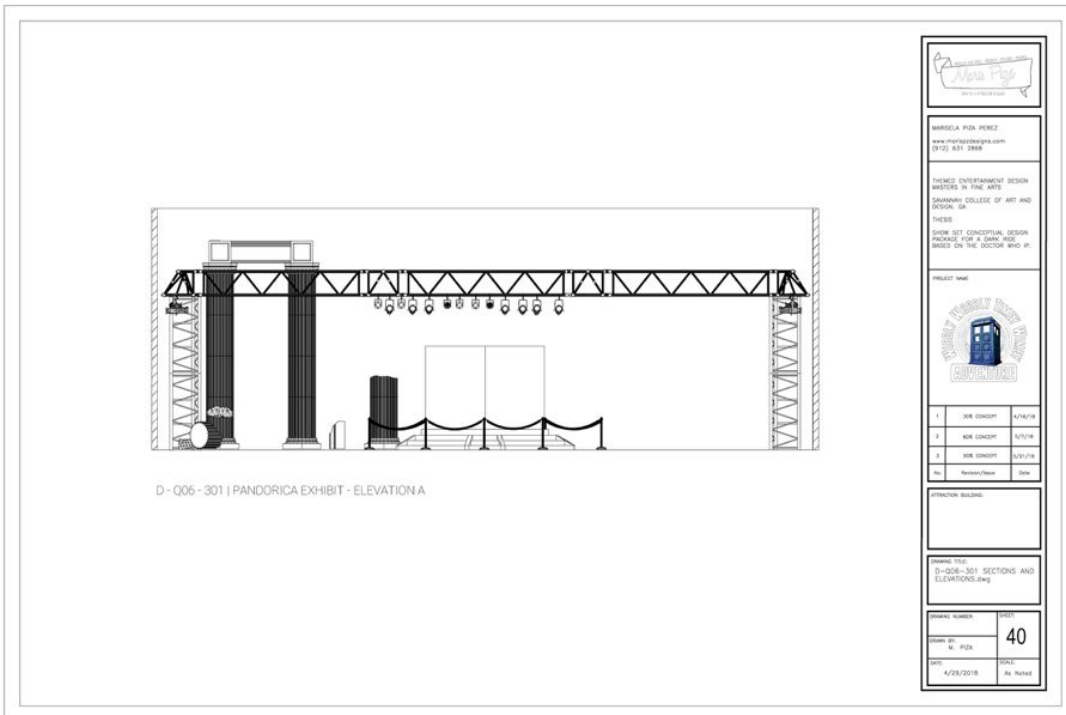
D-Q06-301 | Pandorica Exhibit - Sections and Elevations
